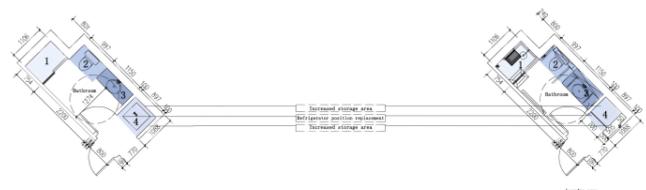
Modified Floor Plan of the Adjacent Transition Space (Kitchen-Side Bathroom) (Source: Self-drawn)
